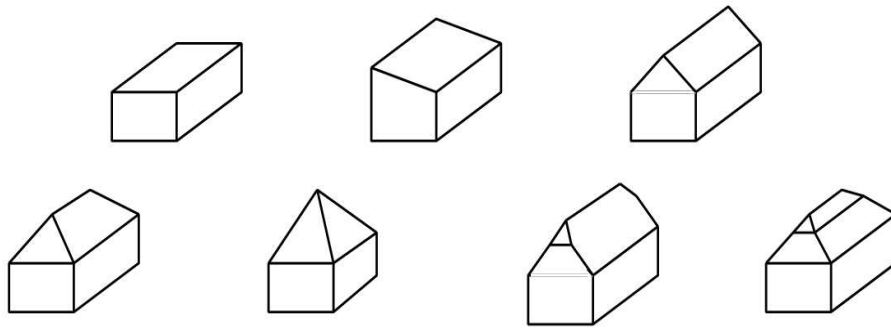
Basic building models - flat roof, pent roof, gable roof (first row) and hip roof, pavilion roof, hipped-gable roof, and mansard roof (second row) MÜLLER (1998)
